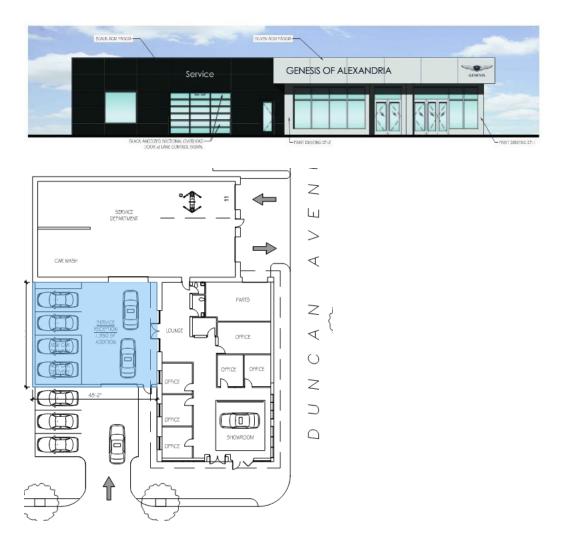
1801 Mount Vernon Avenue proposed elevation and site plan changes noted in color
